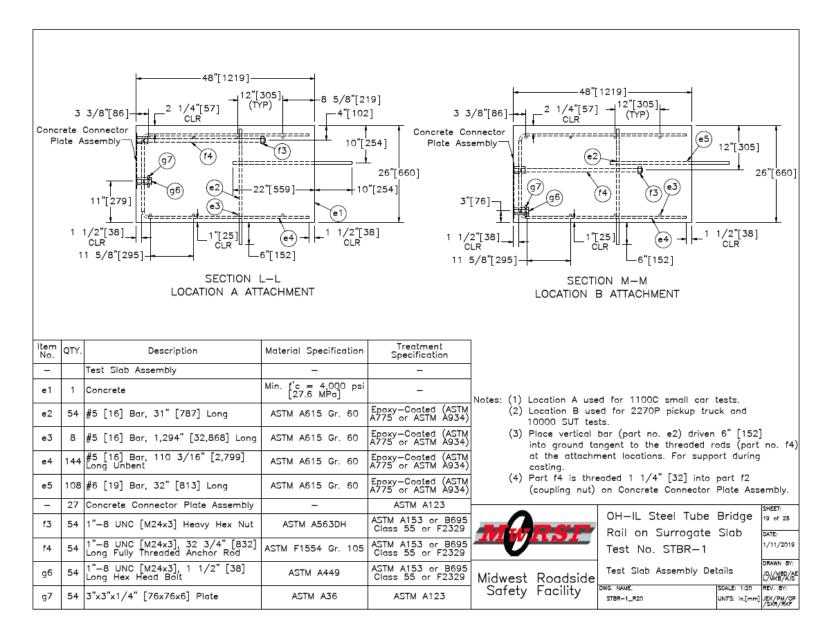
Test Slab Assembly Details, Test No. STBR-1
